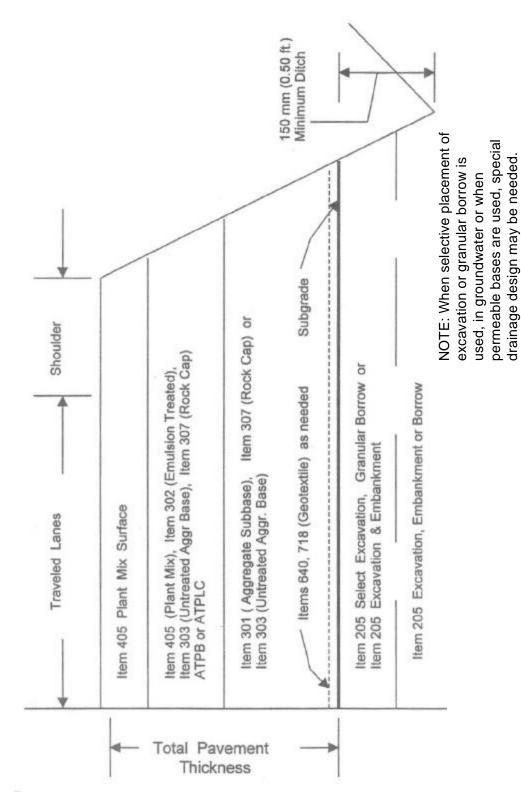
STRUCTURAL ELEMENTS OF FLEXIBLE PAVEMENTS
